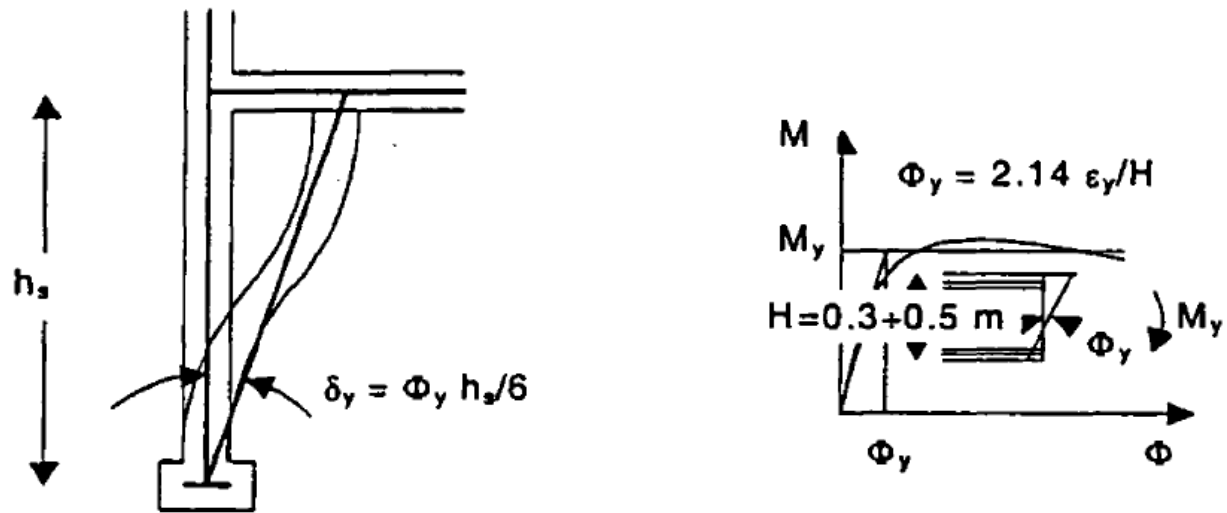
Idealised structural response of reinforced concrete sections and columns at yield.
